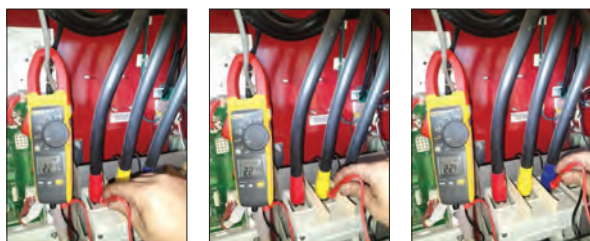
Checking the voltage of the single phase of the electric motor control fire pump extinguished.
